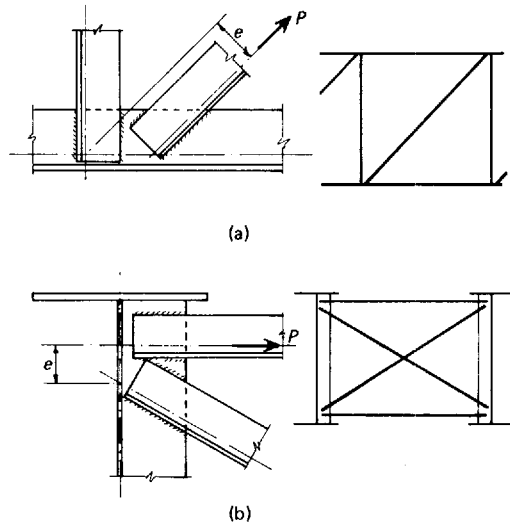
Eccentricities in truss connections. (a) Pratt truss; (b) cross-bracing between plate girders
